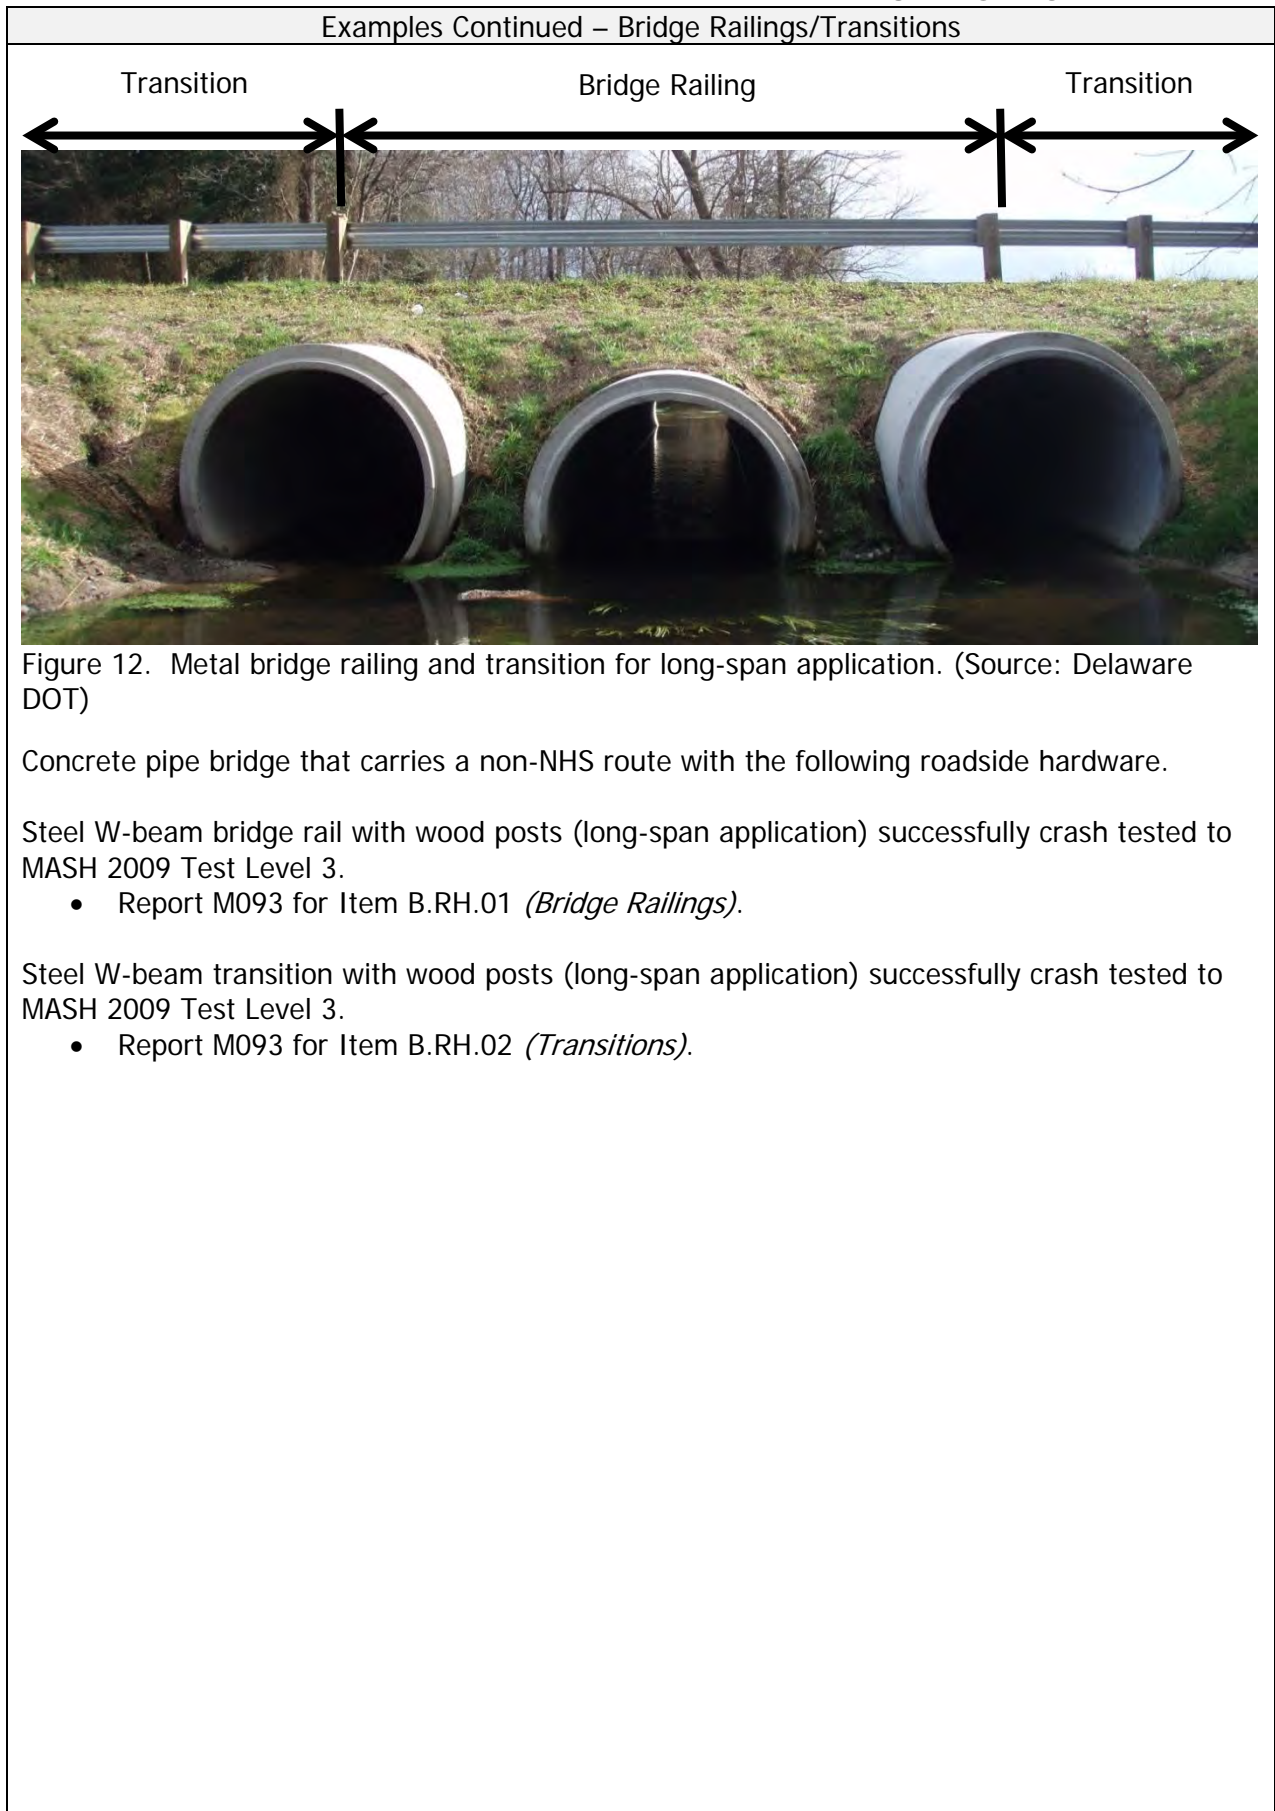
Metal bridge railing and transition for long-span application. (Source: Delaware DOT)
